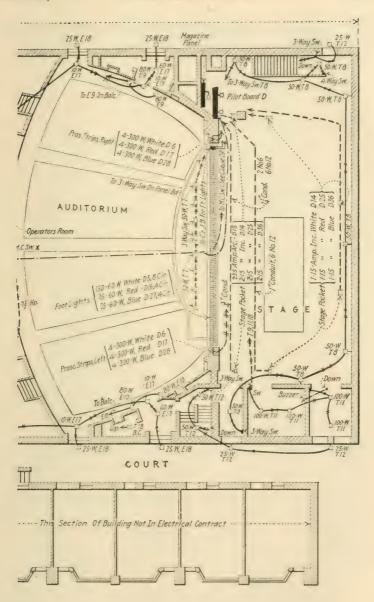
First floor plan of Indiana Theatre, Terre Haute, Ind., showing
